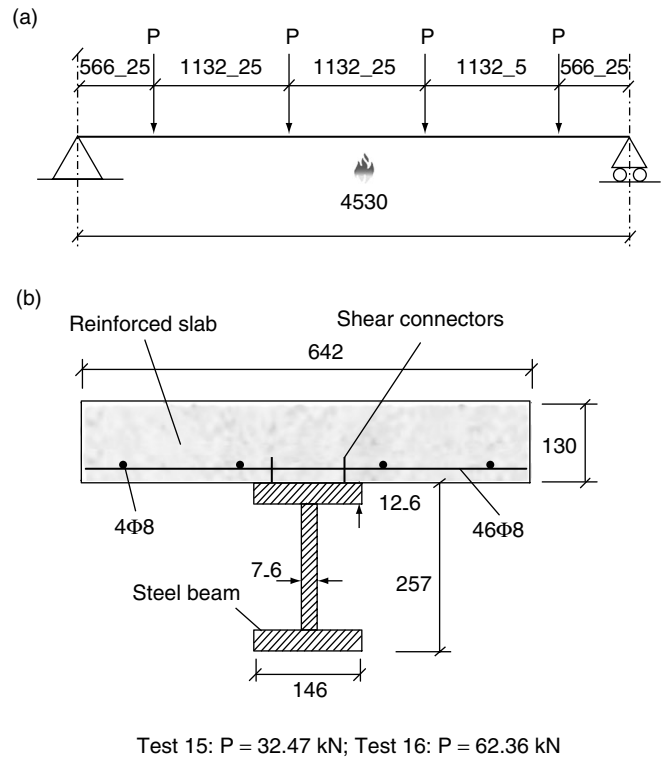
Schematic of tested composite beam (Test 15 and Test 16) (all dimensions in mm)
